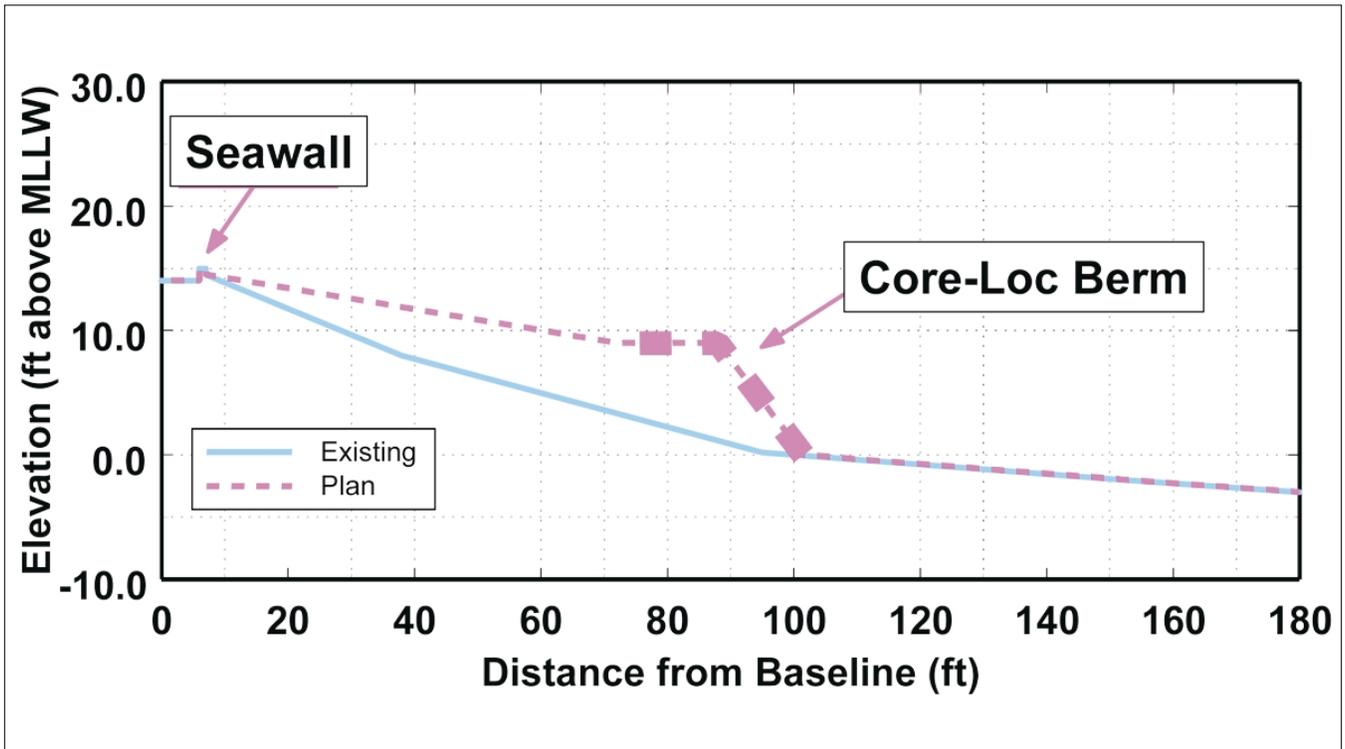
Example of existing and plan profiles (To convert feet to meters, multiply by 0.3048)
